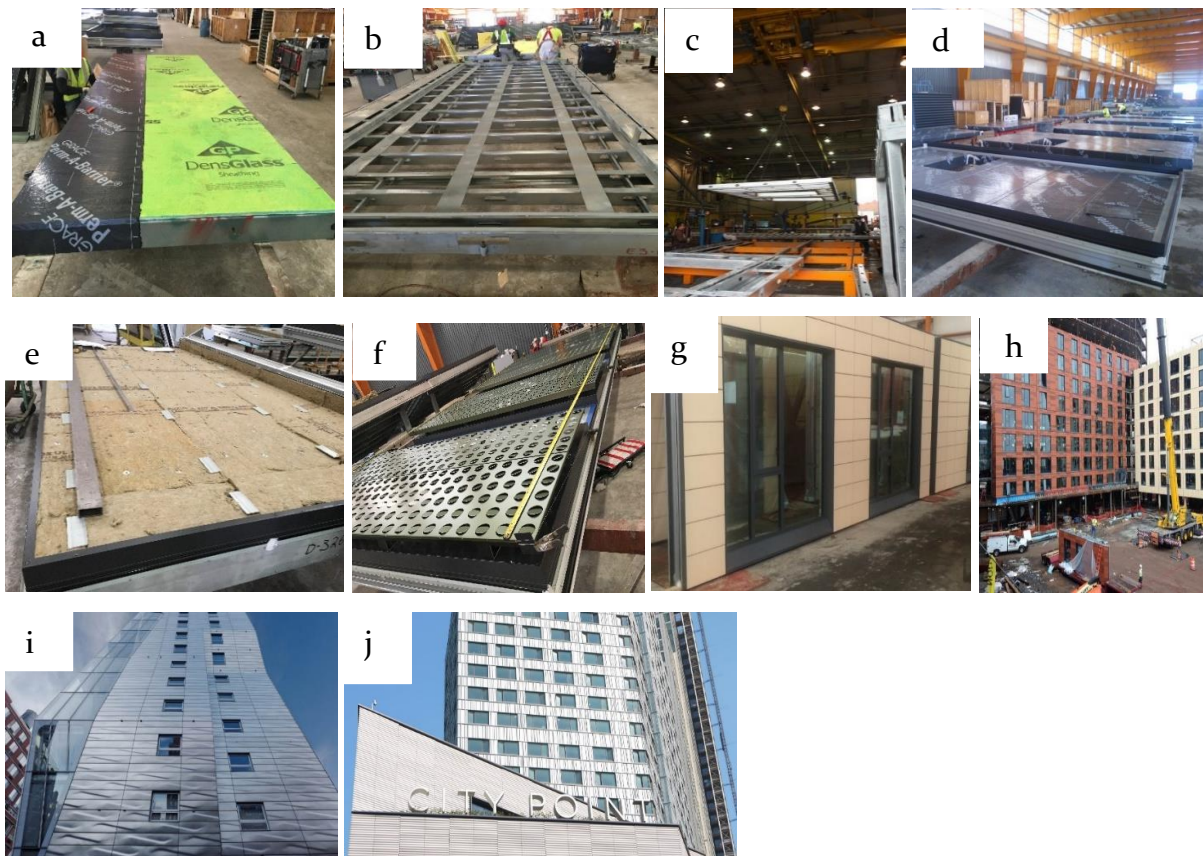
a) Rigid sheathing; b) steel frame; c) welded steel frame; d) perimeter extrusion and gasket applied; e) Rockwool installed; f) cladding installed; g) completed panel; h. i. j) installed façade system [11]
